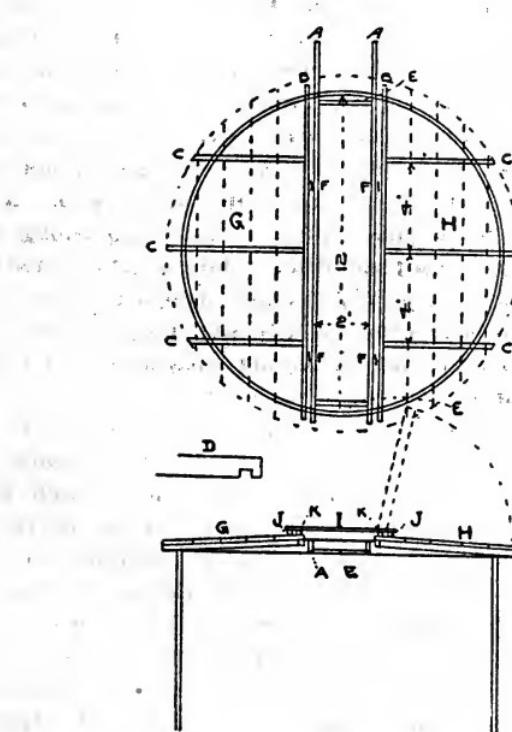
A CHEAP ROOF OF STAVE SILO.
